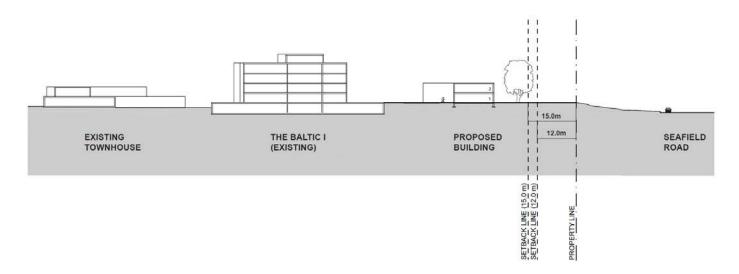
Section through 2-storey building at Seafield Road looking northwest
